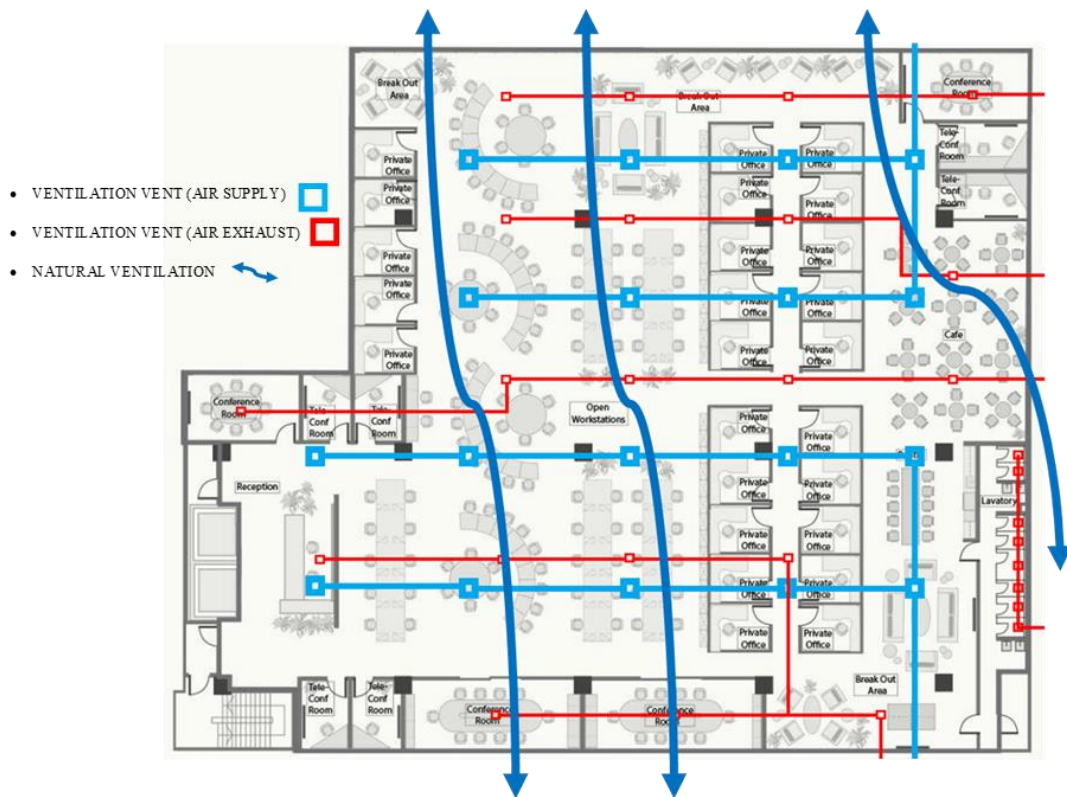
mechanical ventilation in an office building as per green building codes (source- author)
